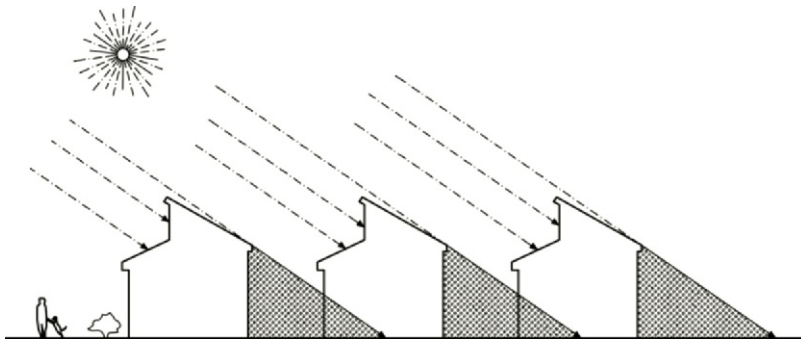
When solar access is not possible for the whole building, clerestories and active roof collectors should be used.
